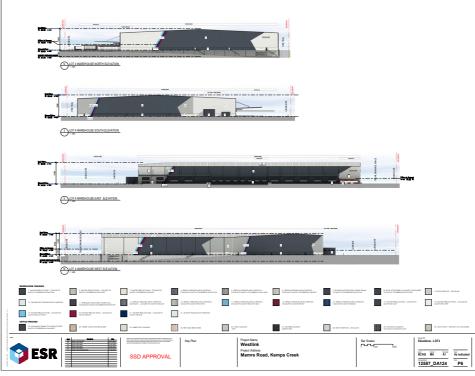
Elevations Lot 4 - (Source: Nettletontribe)
